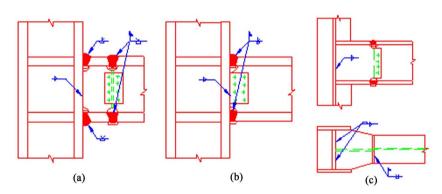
Schematic diagram of welding method 图 7. 焊接方式示意图
